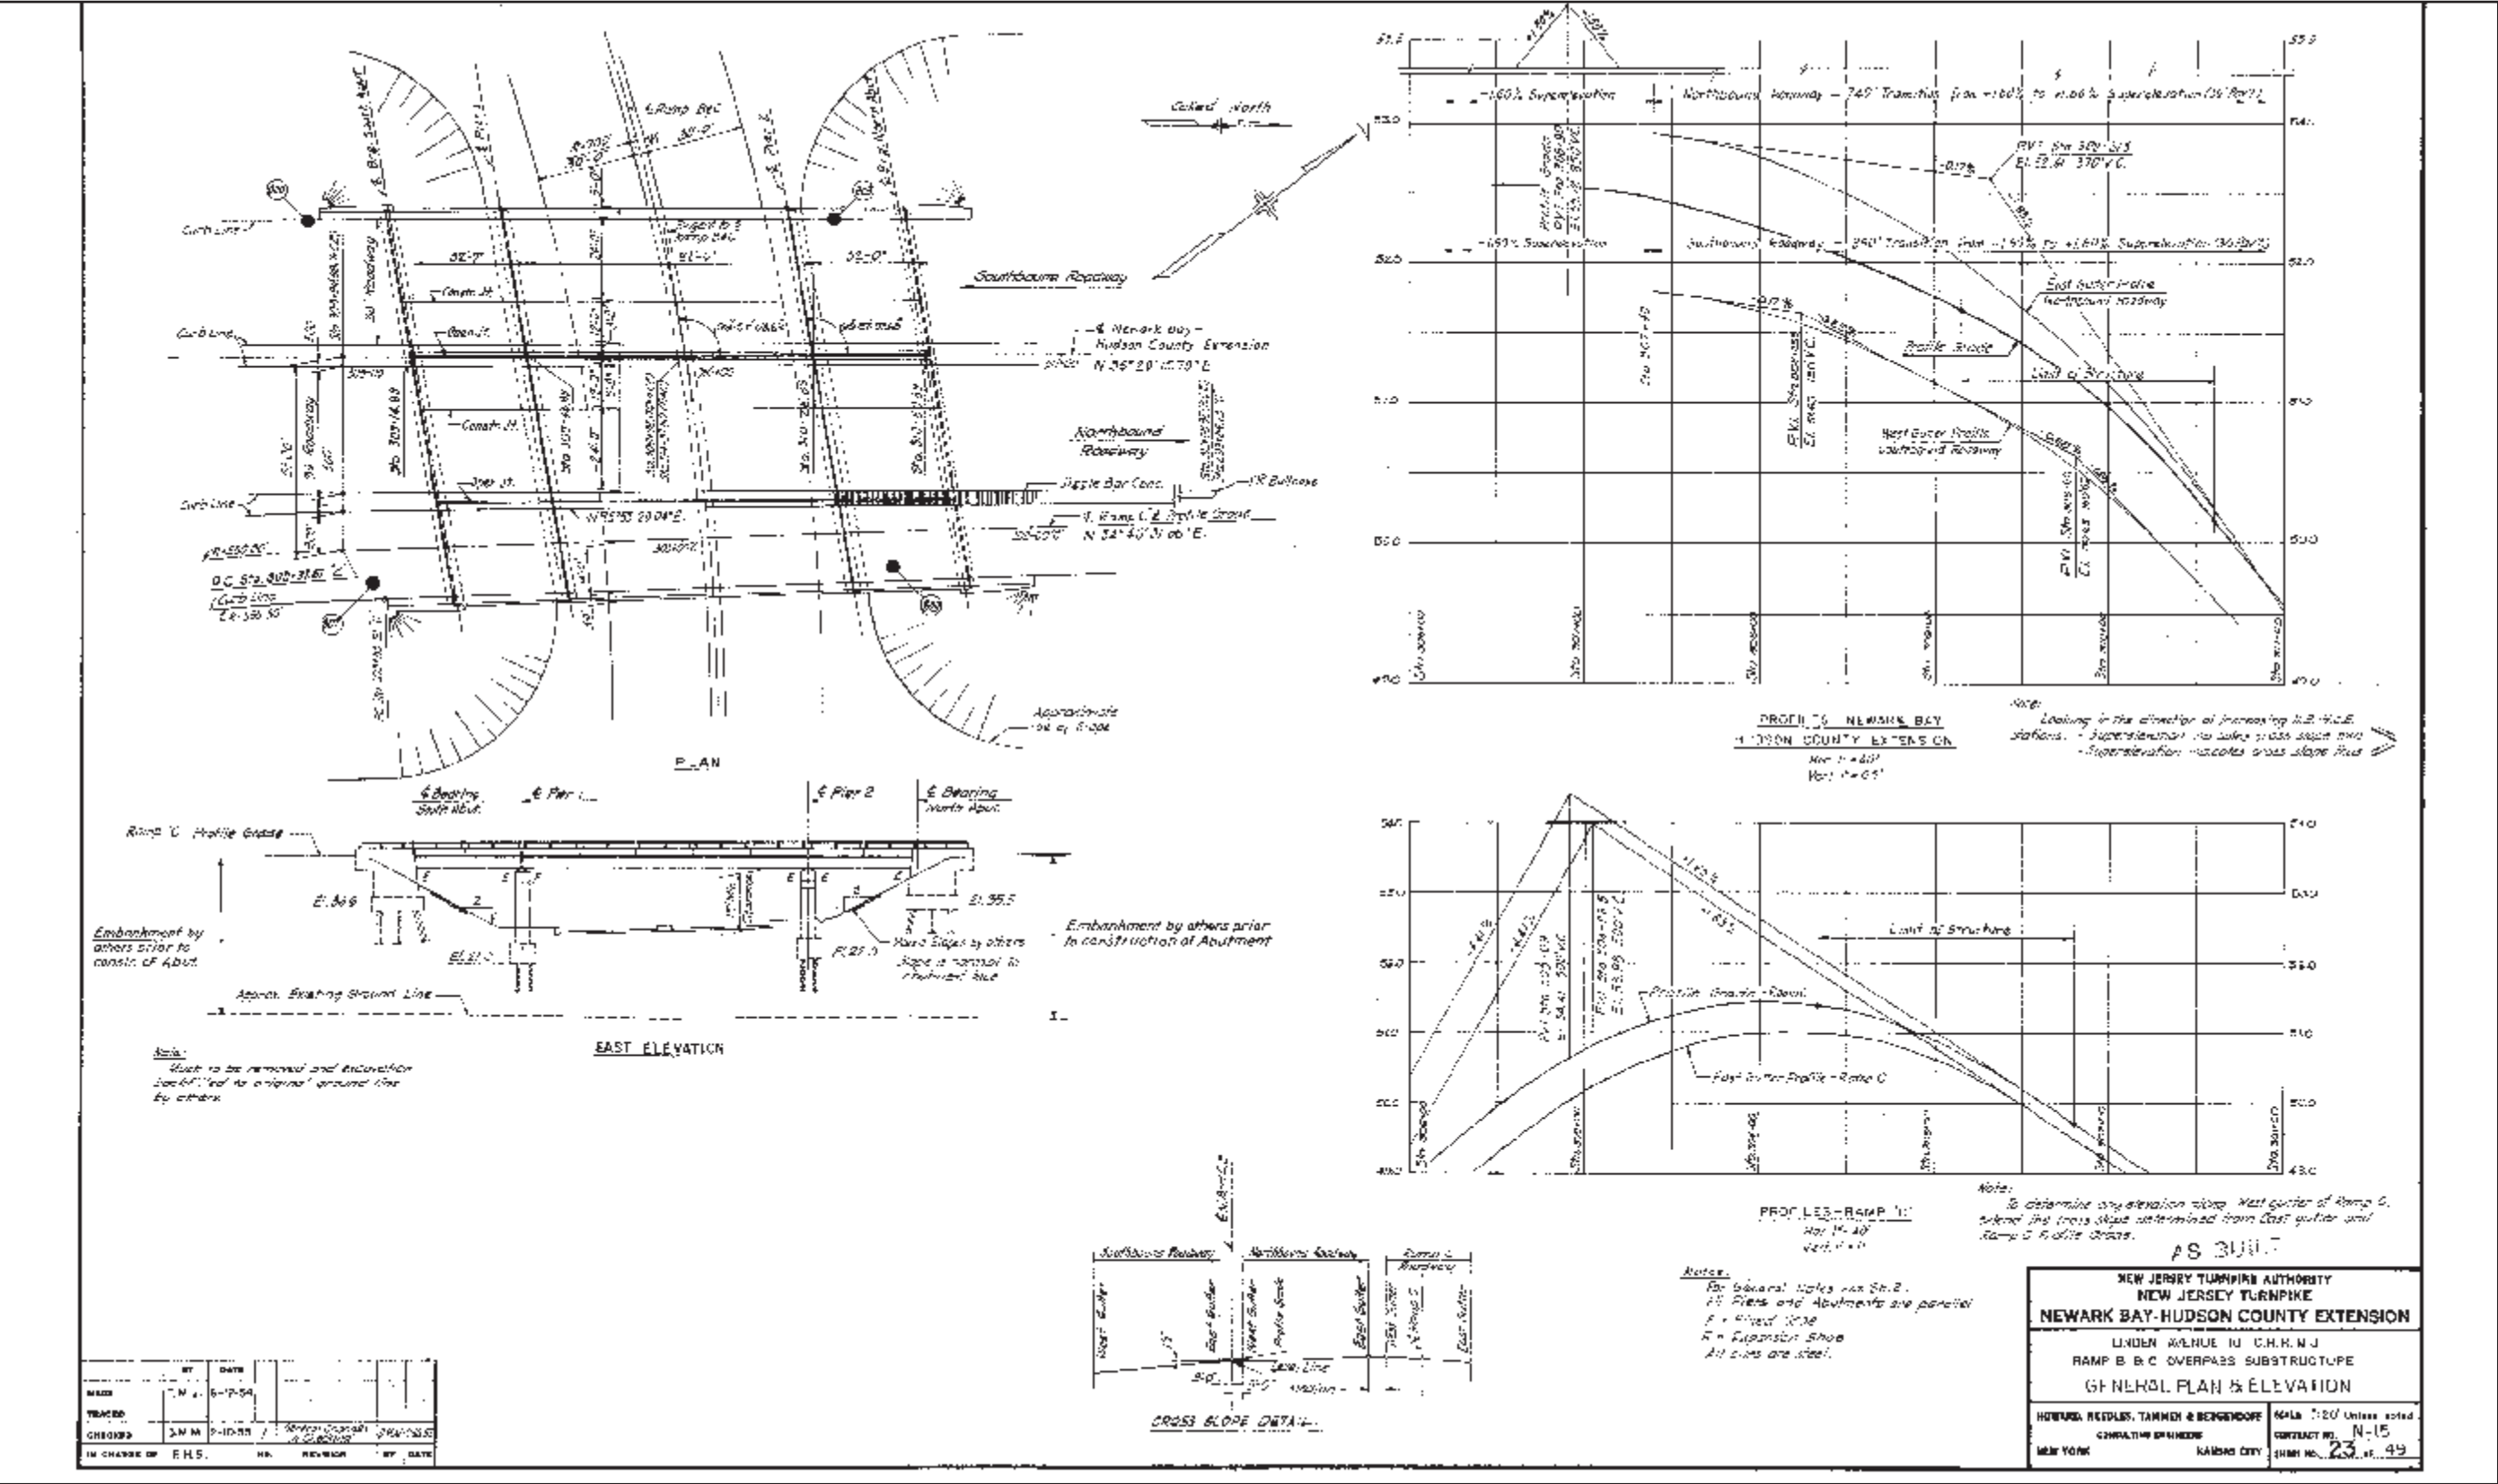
1955 as-built construction drawing showing the general plan and elevation of the Ramp B and C Overpass (later known as the Bridge over Ramps B and C) (HNTB 1955i).
